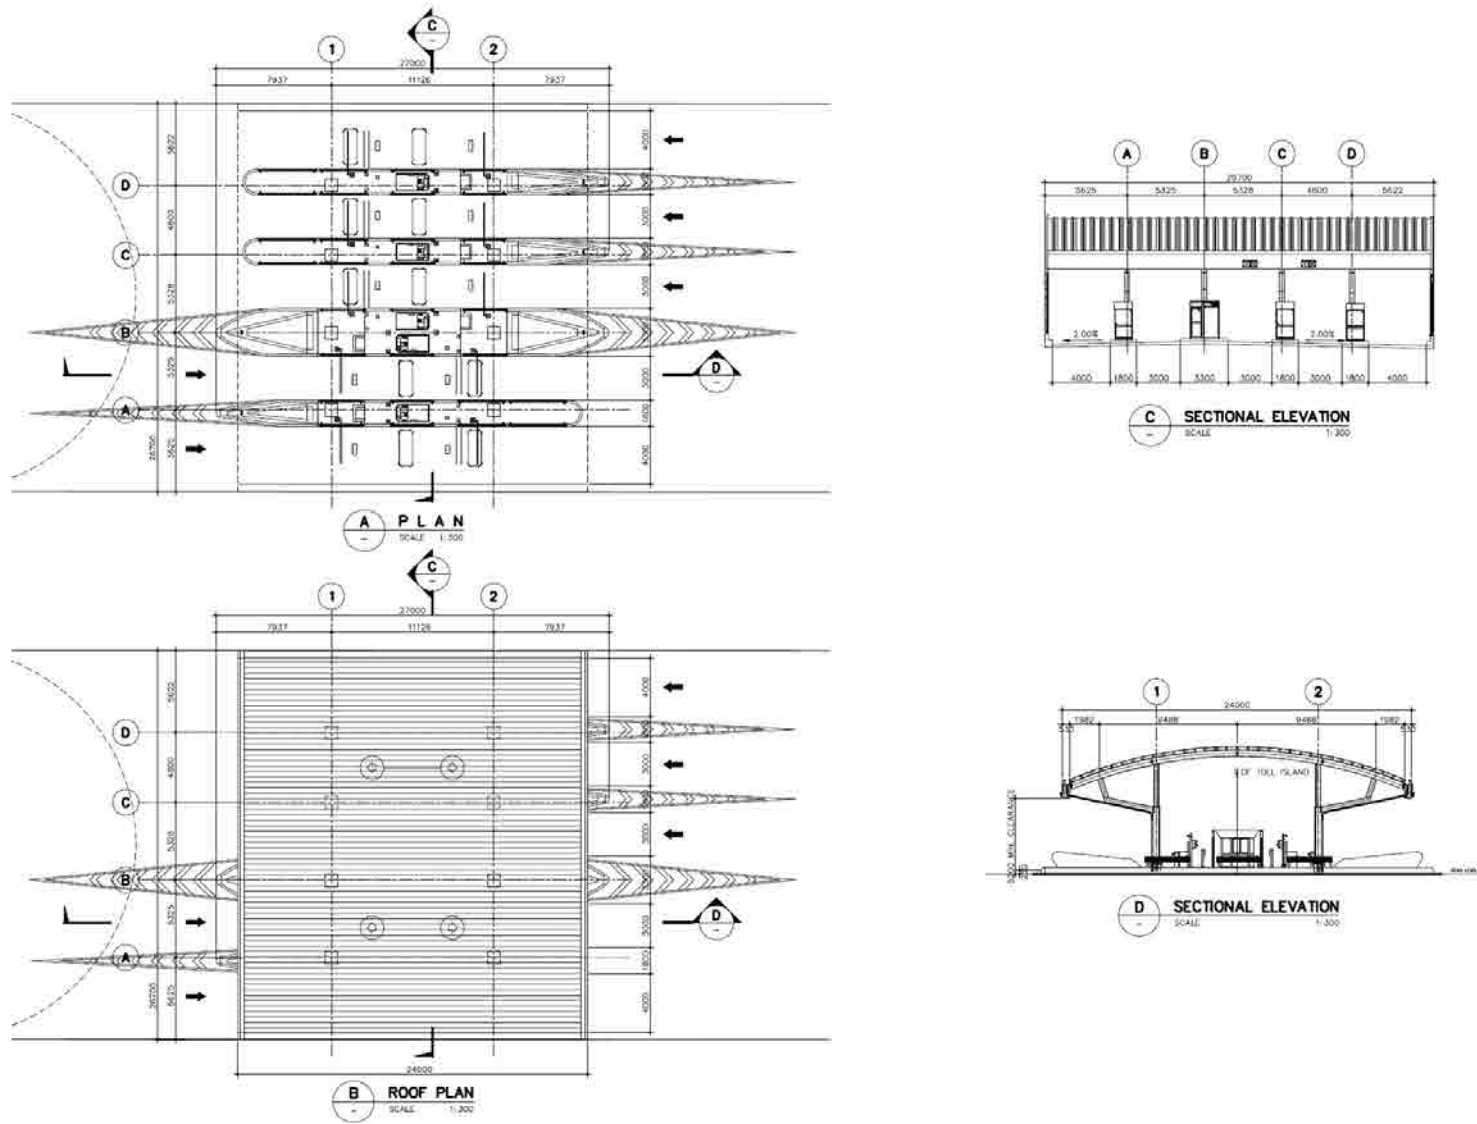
(4) TYPICAL DRAWING OF TOLL BOOTH LAYOUT (4BOOTHS)
